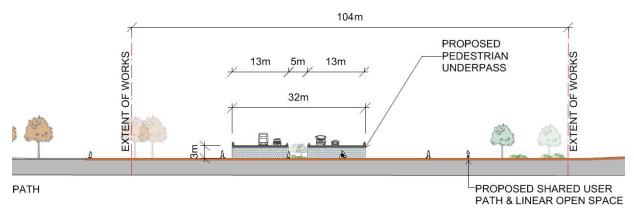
Cross section F with proposed non-standard best practice underpass with dual bridge structure at Park Way shared user trail and Braeside Park western entry, looking north
